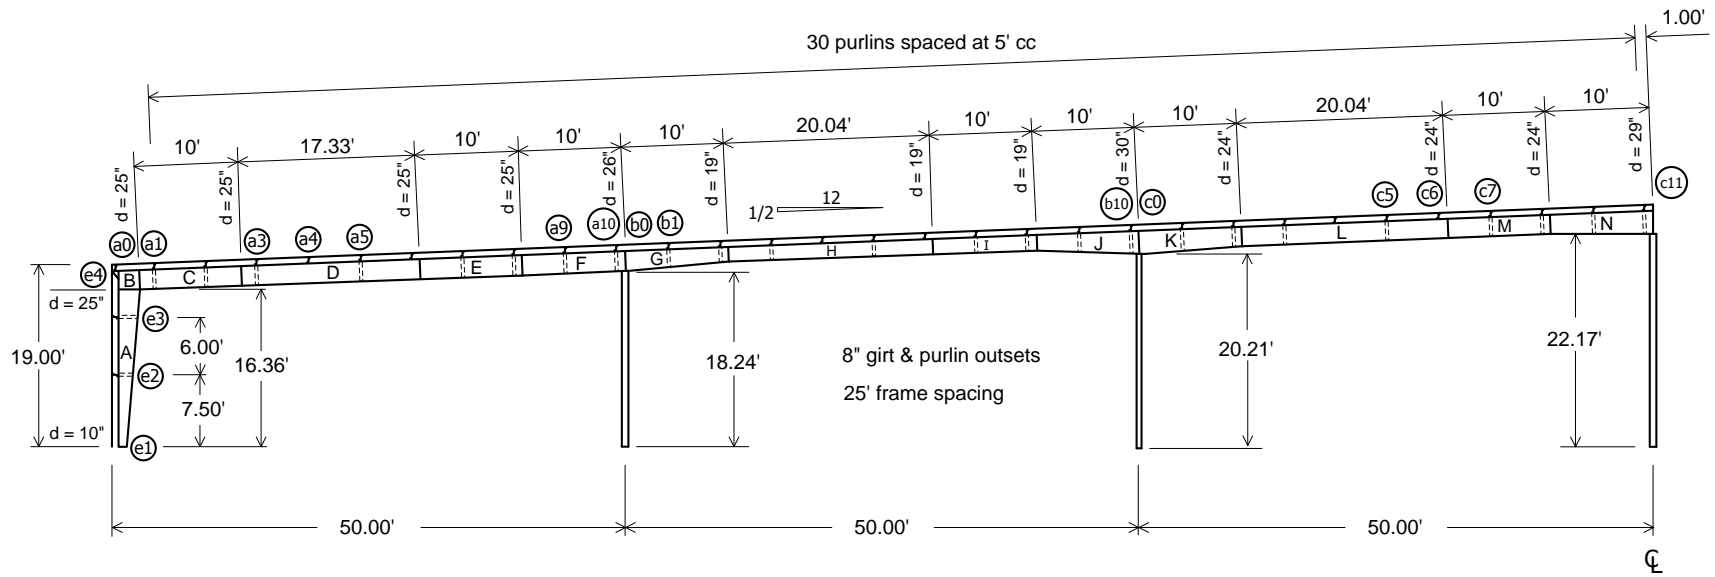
Elevation view of a 300 ft modular frame (only half of the frame is shown) (from Kim 2010)
